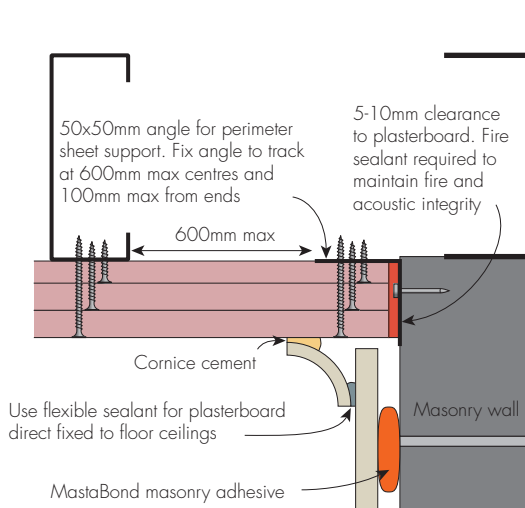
Fire Rated Ceiling to Masonry Wall
